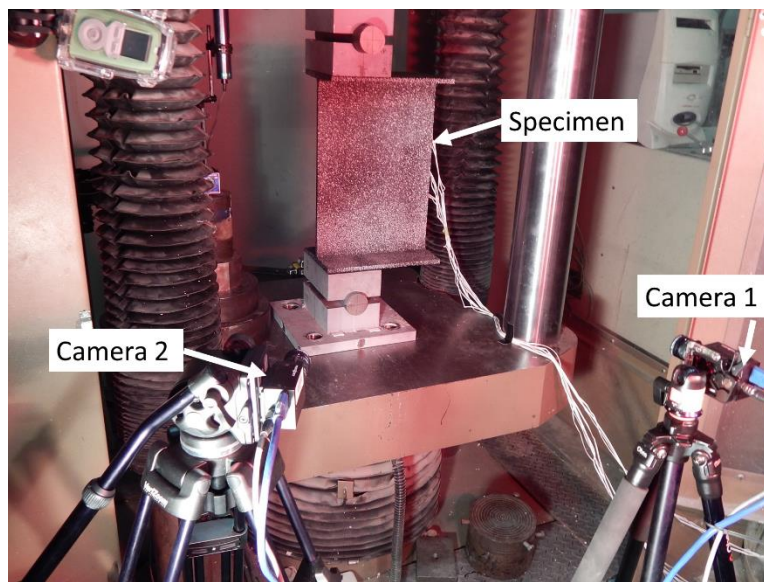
Setup of DIC cameras for experimental testing of corroded girders
